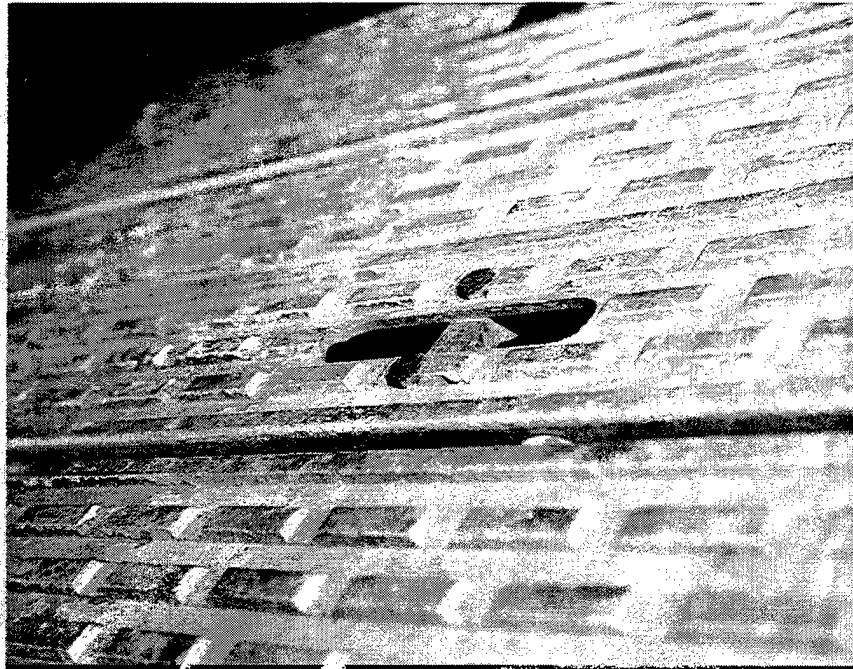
Close-up view of the lifting device showing the lifting steel bar bolted underneath the oblong hole. Note that the bar is perpendicular to the long axis of the hole.
